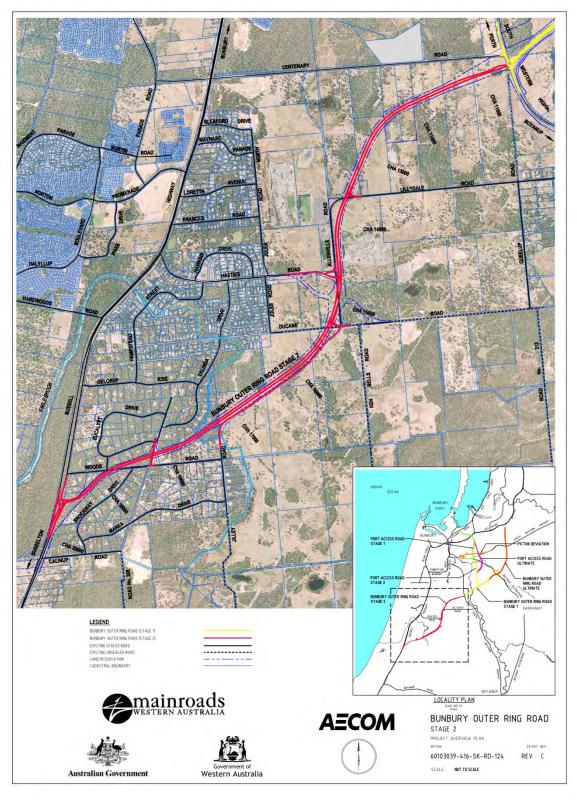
Bunbury Outer Ring Road (Southern Section) Project Area.
